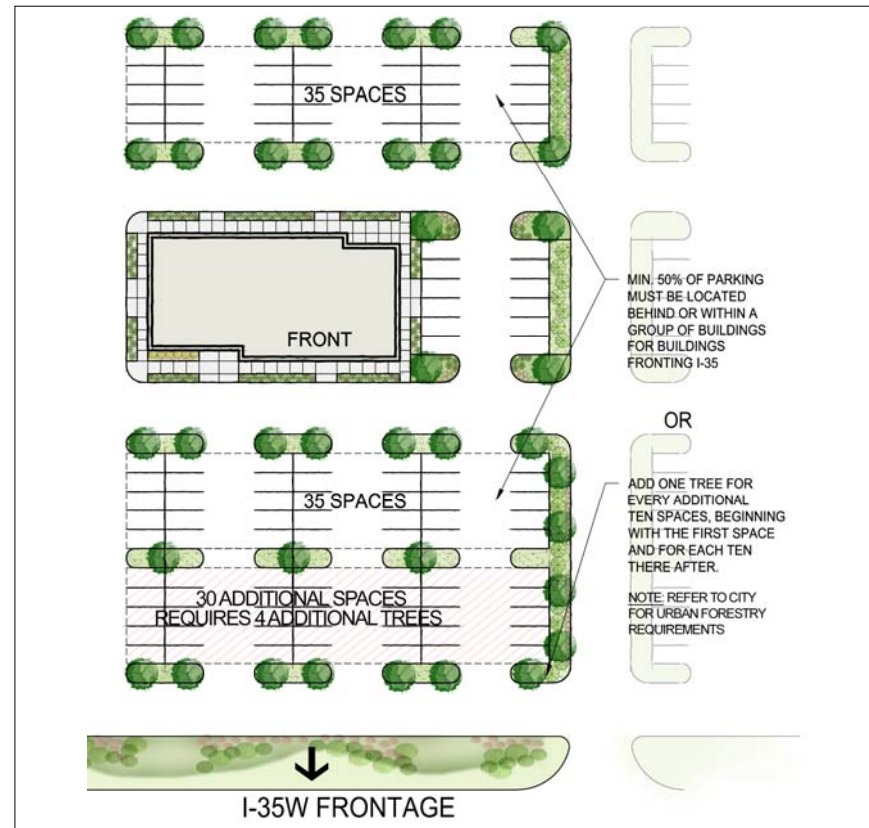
Diagram example of parking requirements when fronting I-35W
